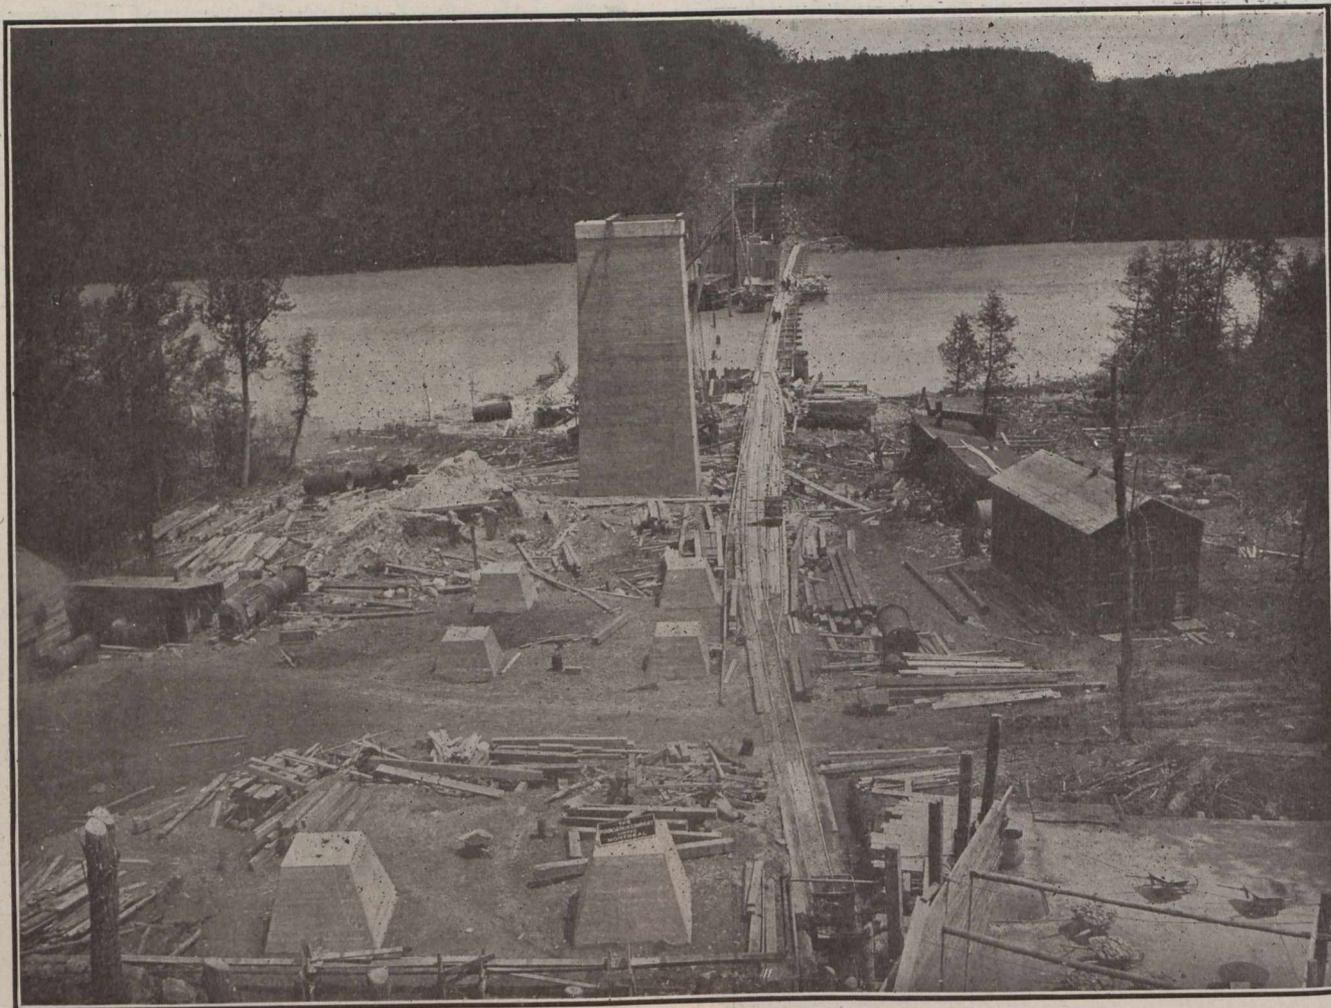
Bird's Eye View Looking East, Showing Pedestals for Steel Work, and Pier No. 4 in the Foreground.
